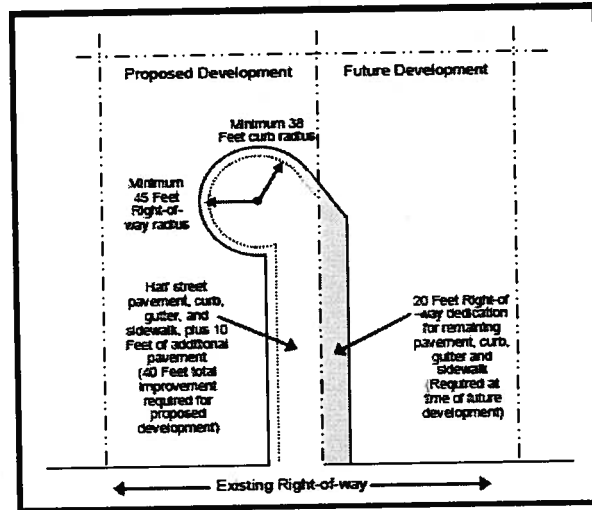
Half-Street Design for 60-foot Right-of-way
